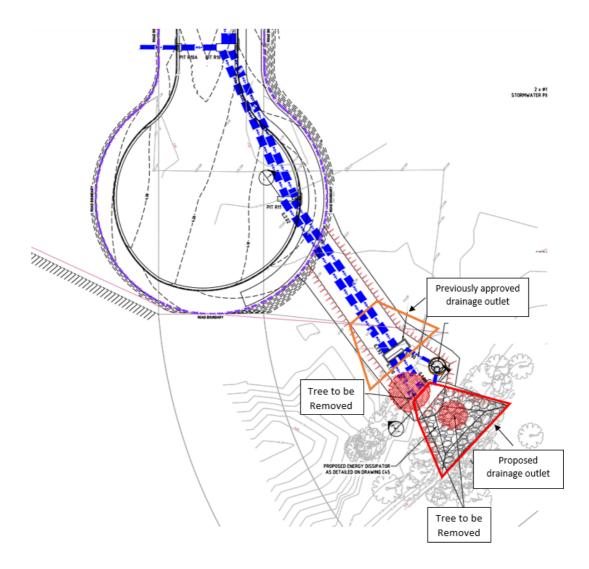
| SSD-10459-Mod-2 - Proposed Stormwater Outlet (shown outlined in red)
